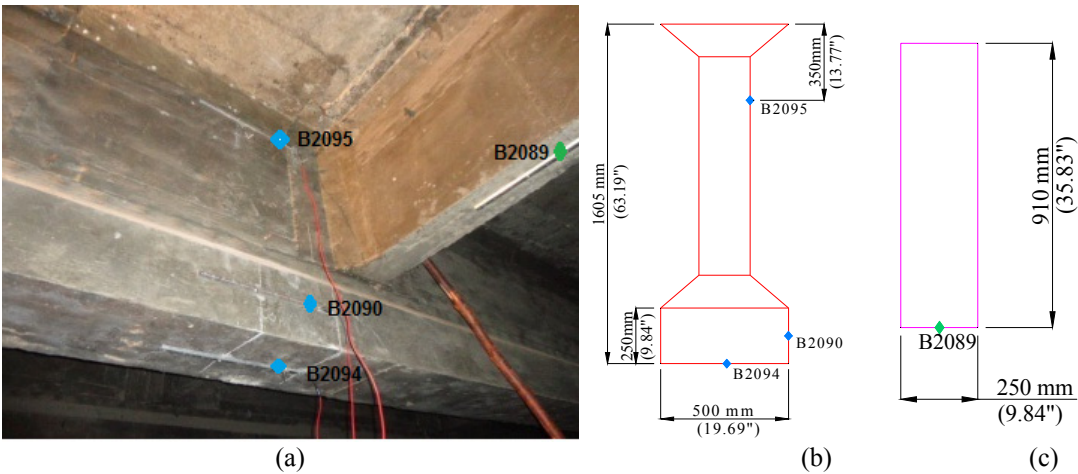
a,b Position of gauges in the longitudinal girder near the abutment
